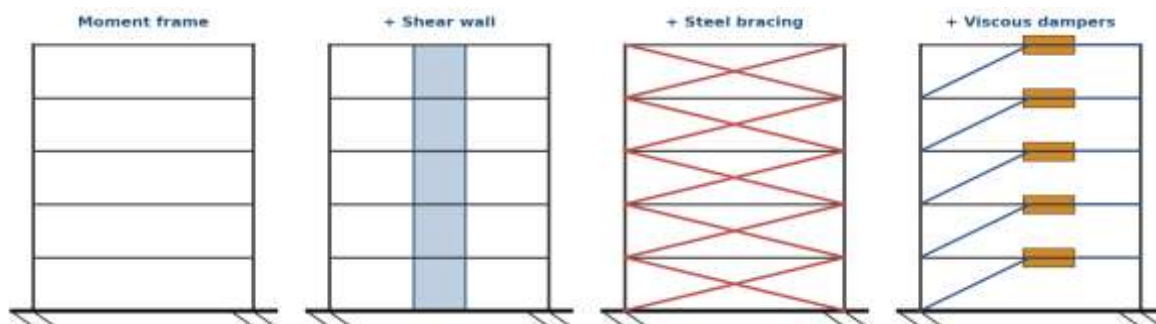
Schematic of a framed high-rise structure with, from left to right, a bare moment frame, an added shear-wall core, steel bracing, and viscous dampers encased in braces.
